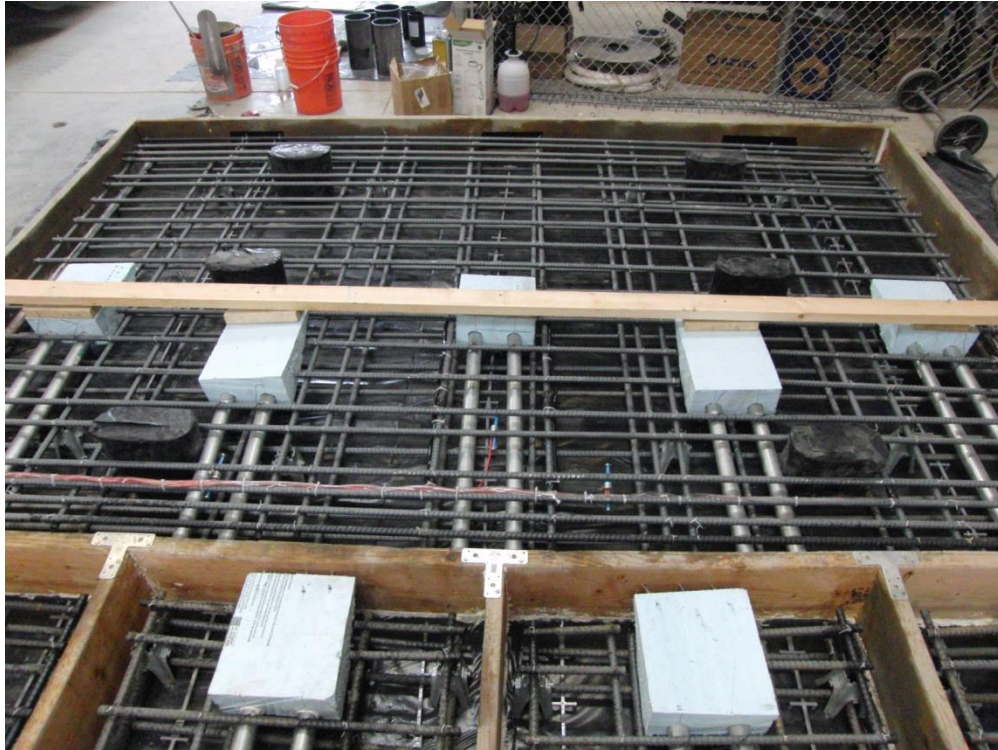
Full-Scale Specimen Rebar and Pocket Layout.
